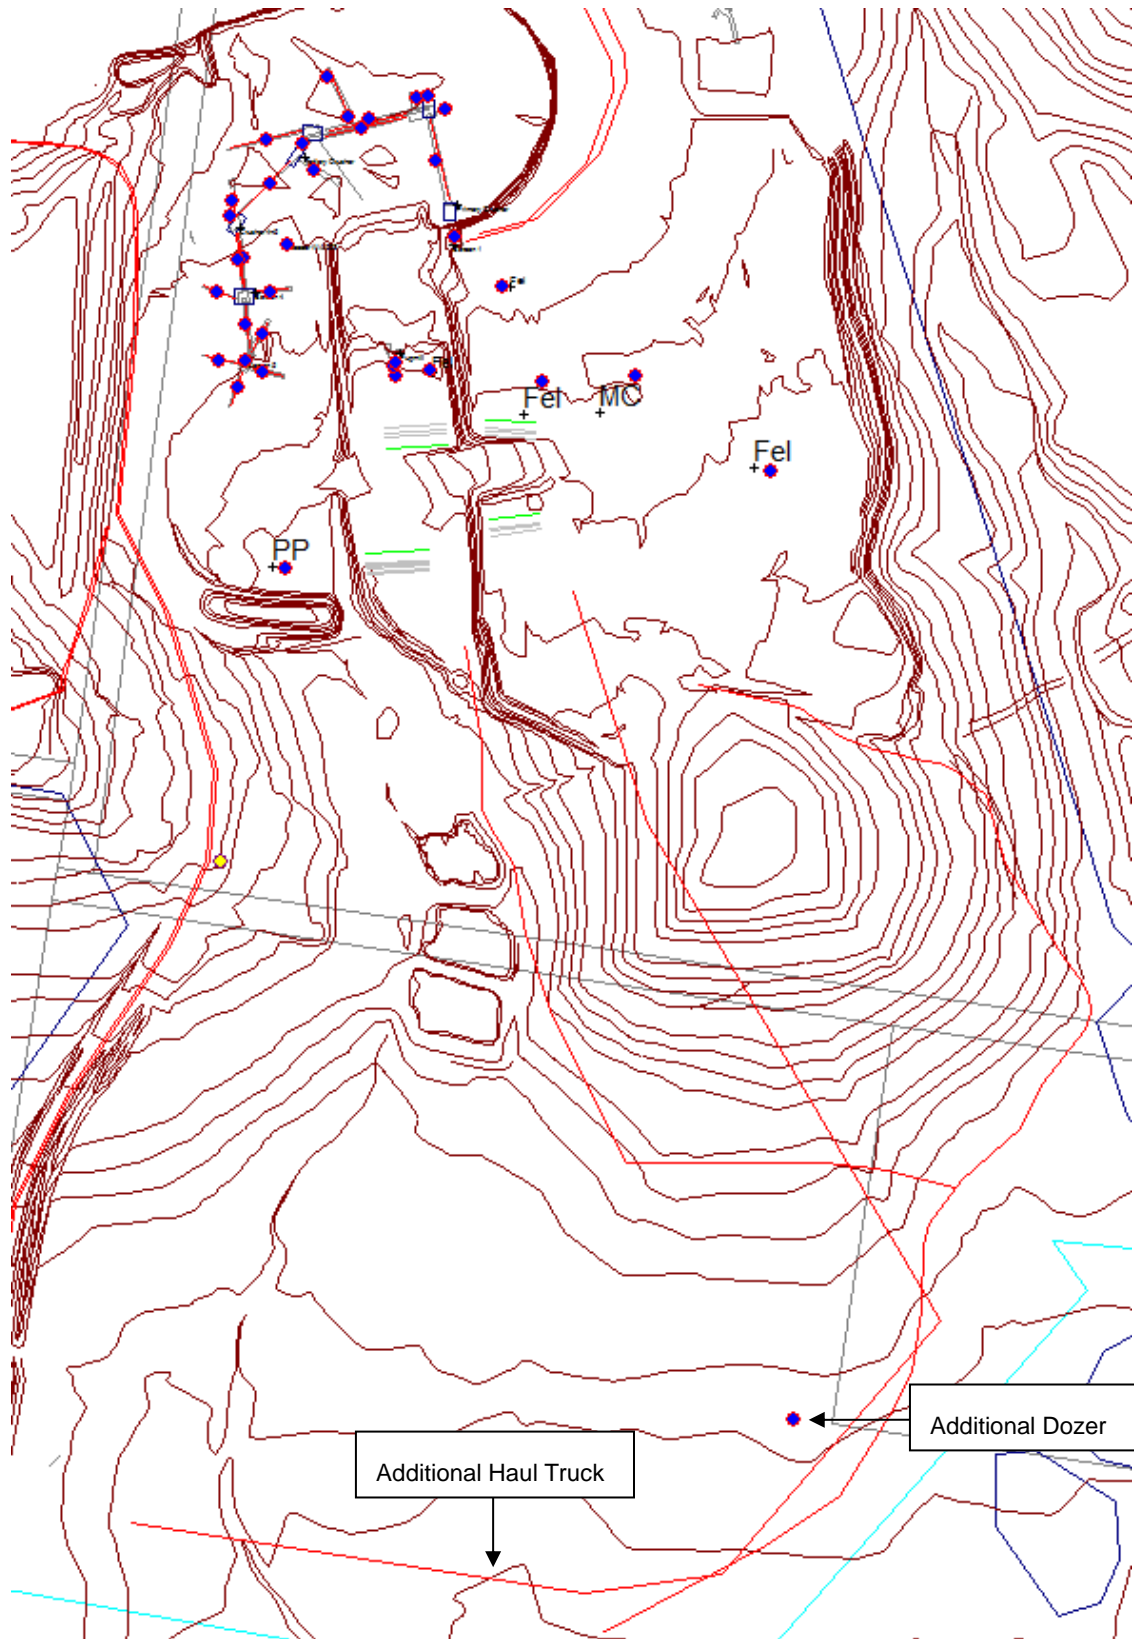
Construction Work Layout (including Stage 1 Operations)
